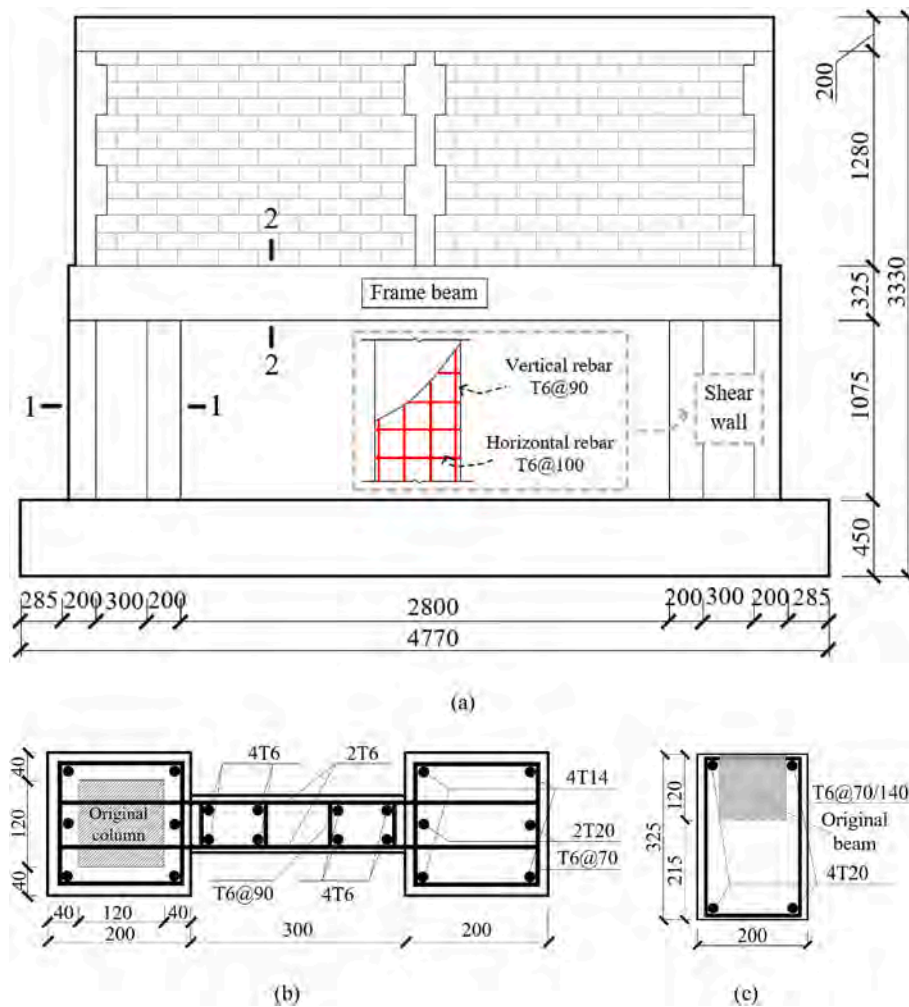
Geometric dimensions and detailing of the specimen W2 (unit: mm): (a) Overall scheme; (b) Section 1-1; (c) Section 2-2.
